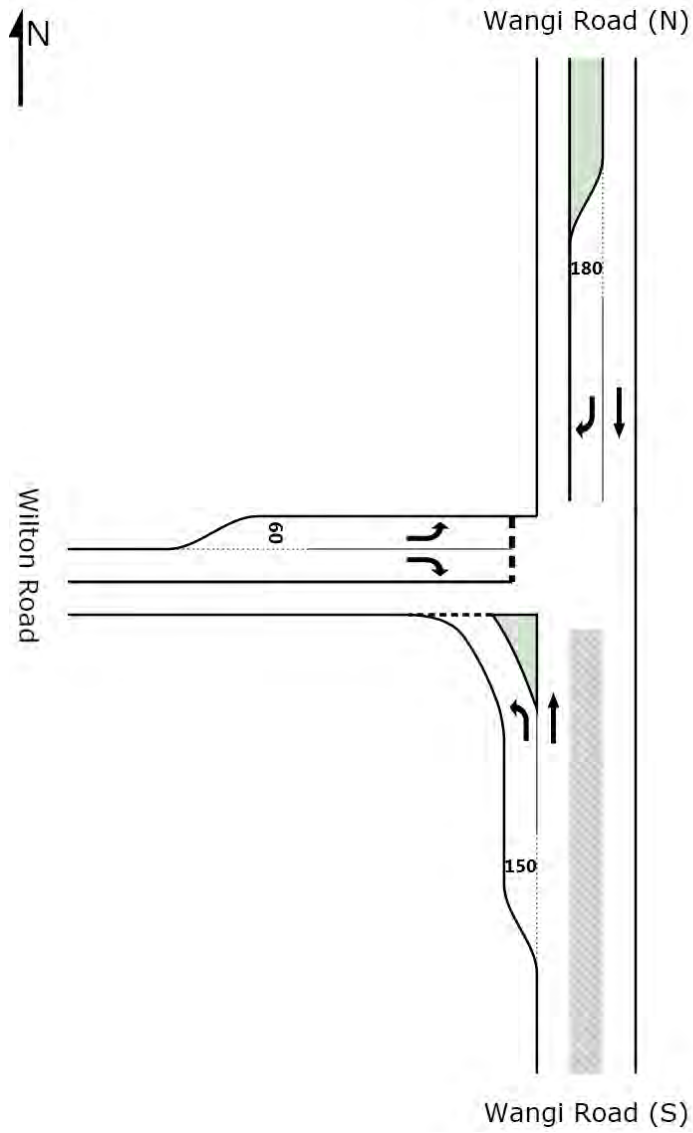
Existing Intersection Layout Wilton Road/Wangi Road
